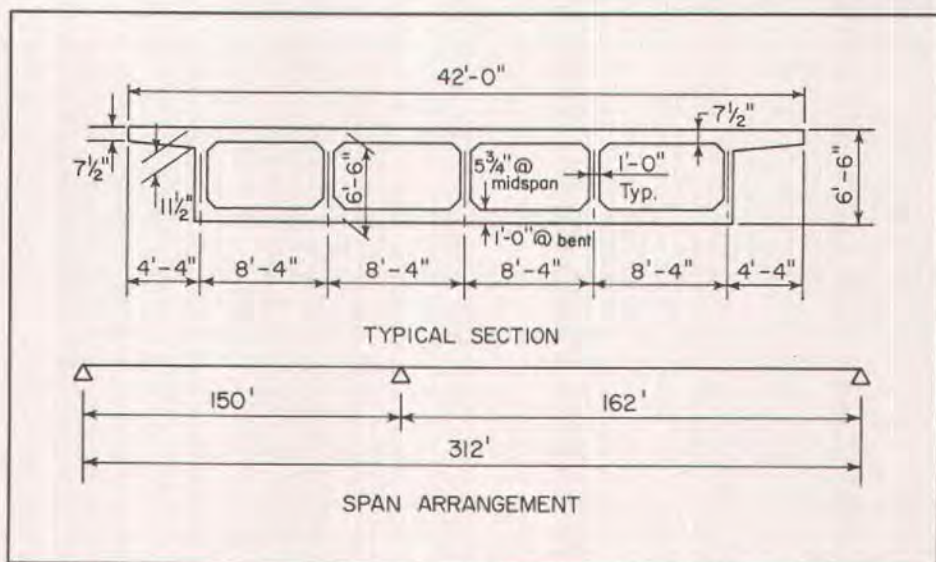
Typical section and span arrangement for two-span box girder bridge.<sup>6</sup>
